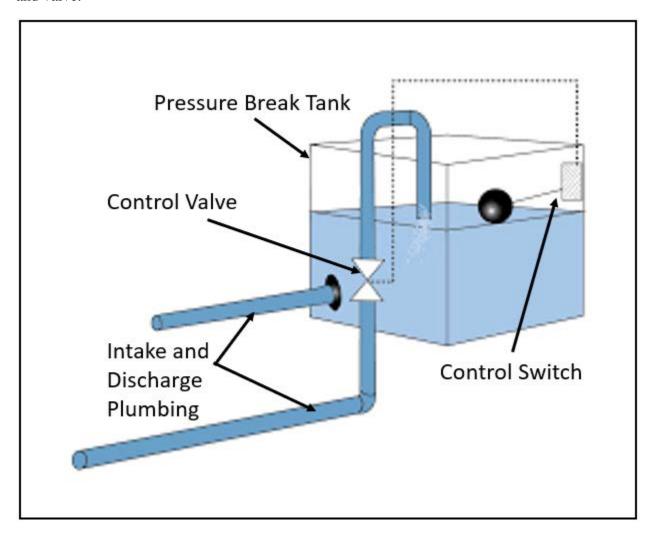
Typical Pressure Break Tank and Control System for Process Water Underground
